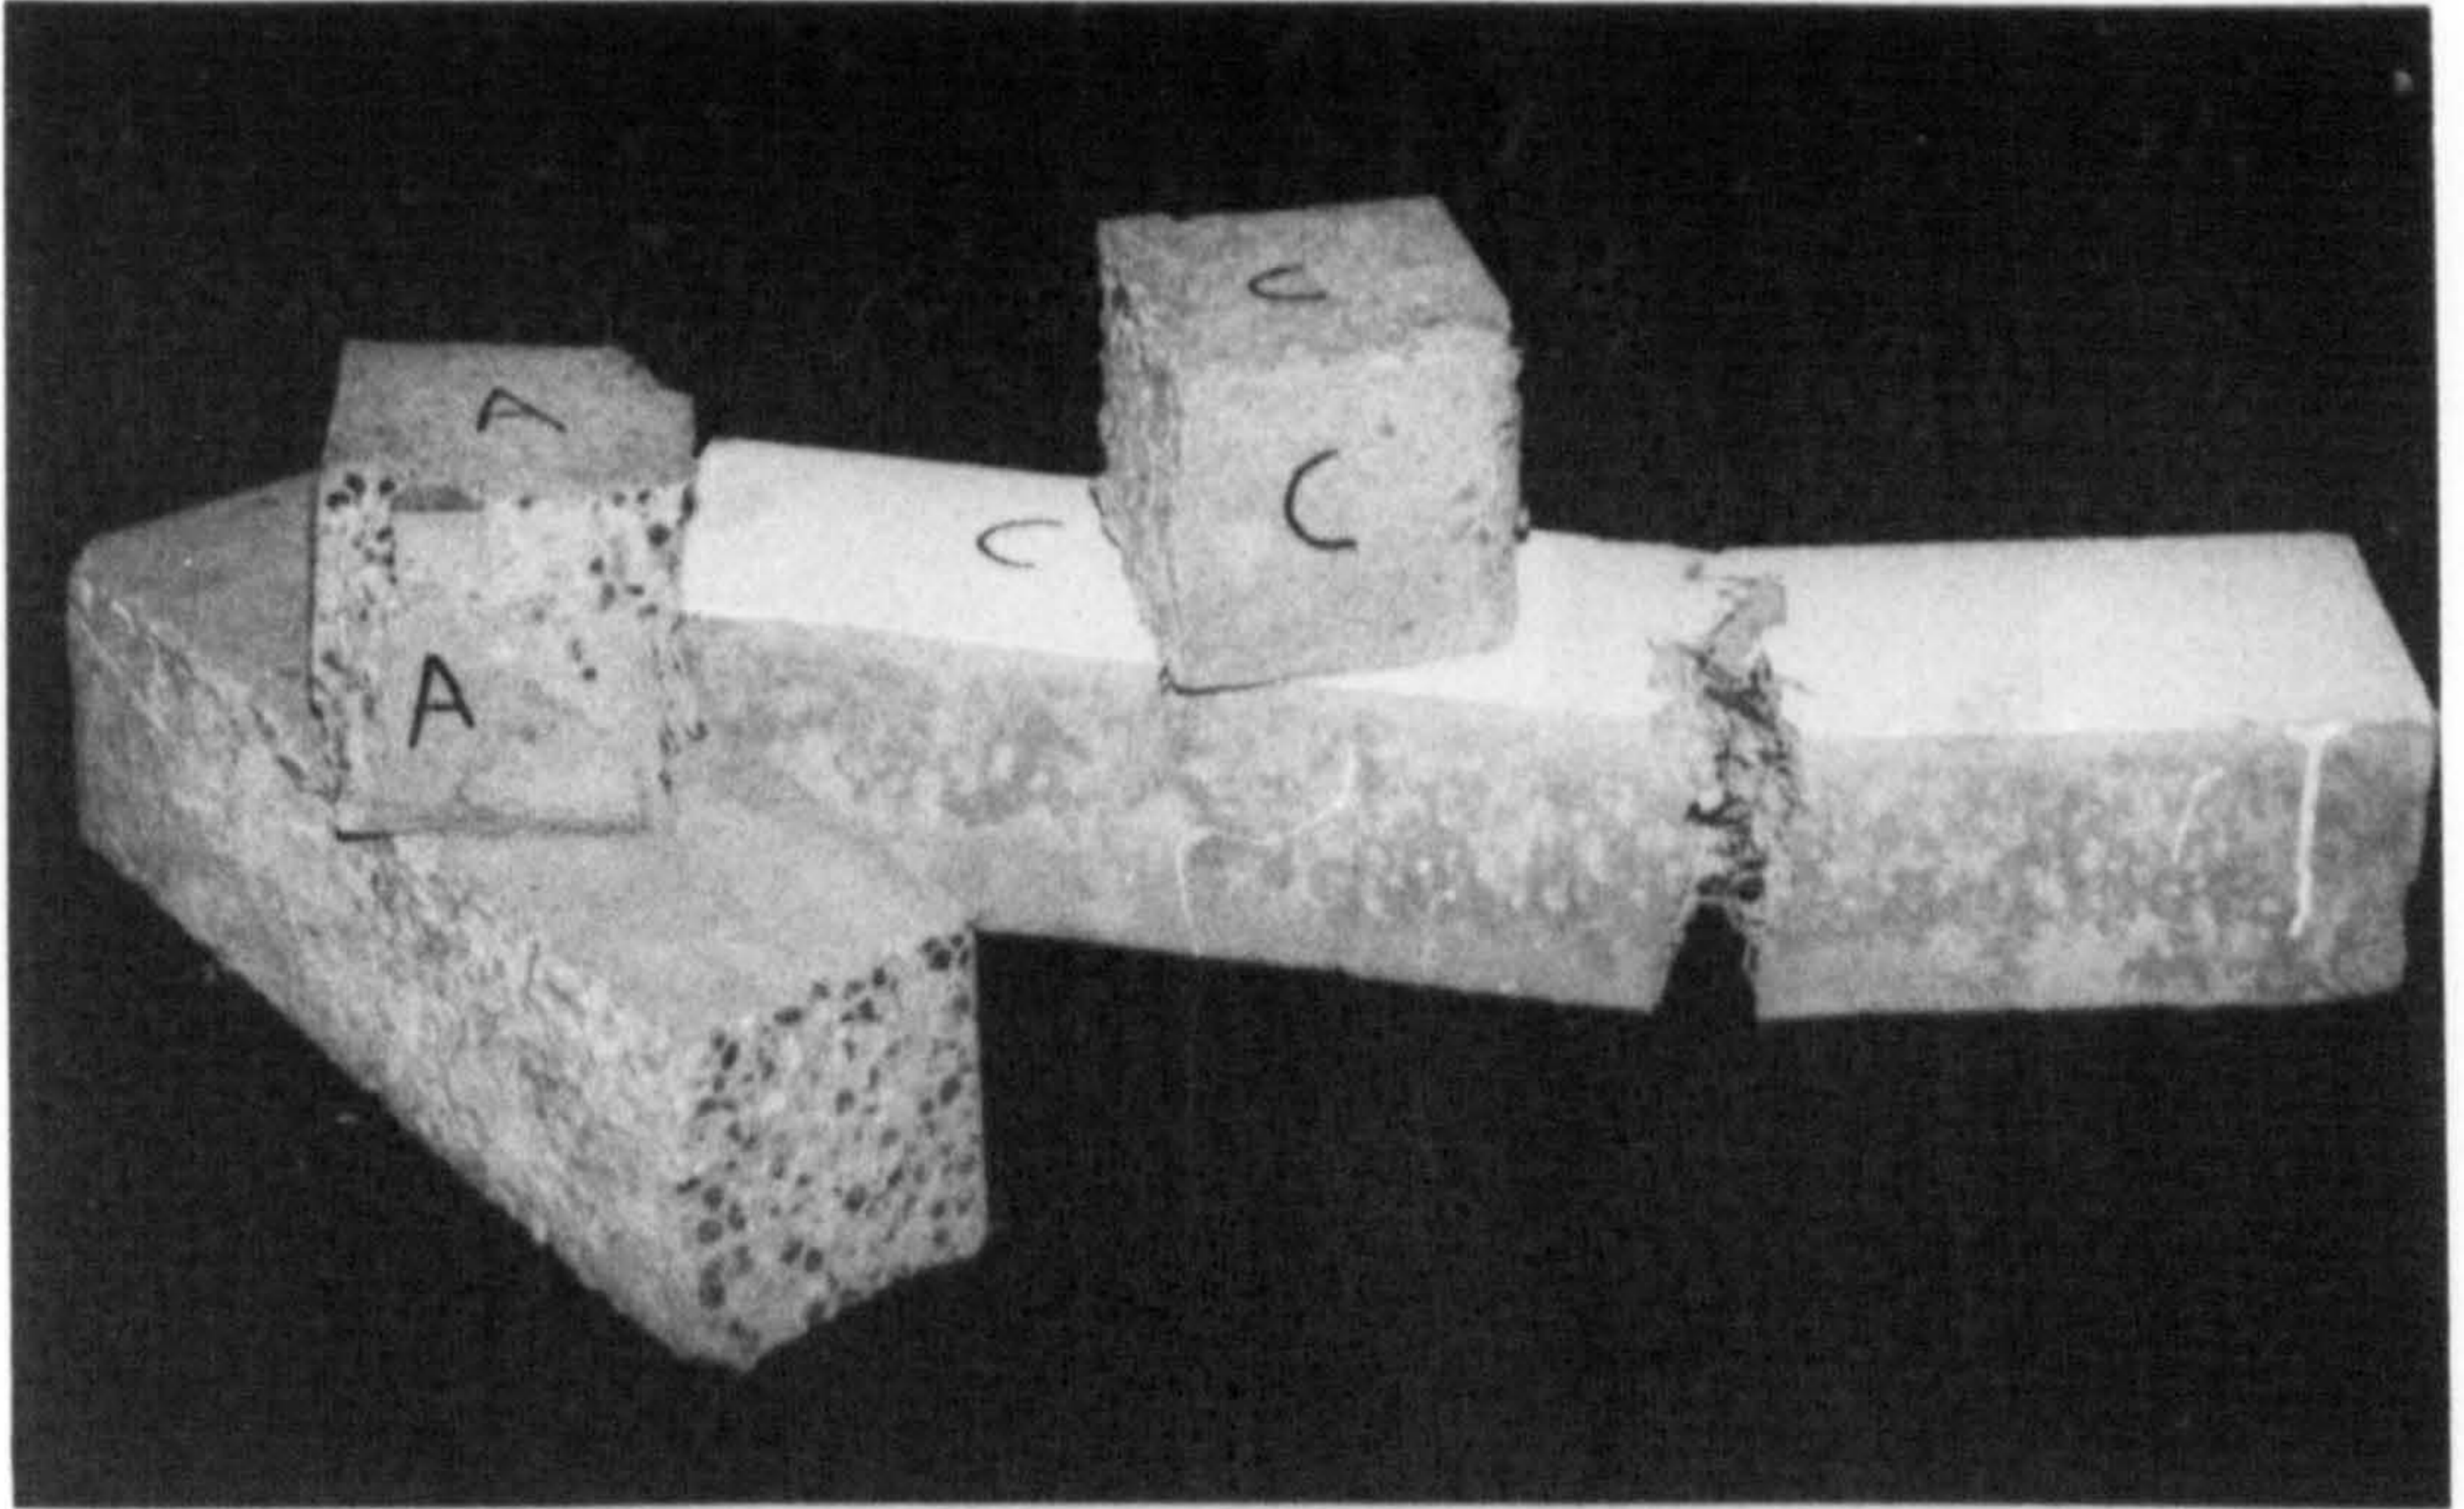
PLAIN AND FIBRE CONCRETE CUBES AND PRISMS
